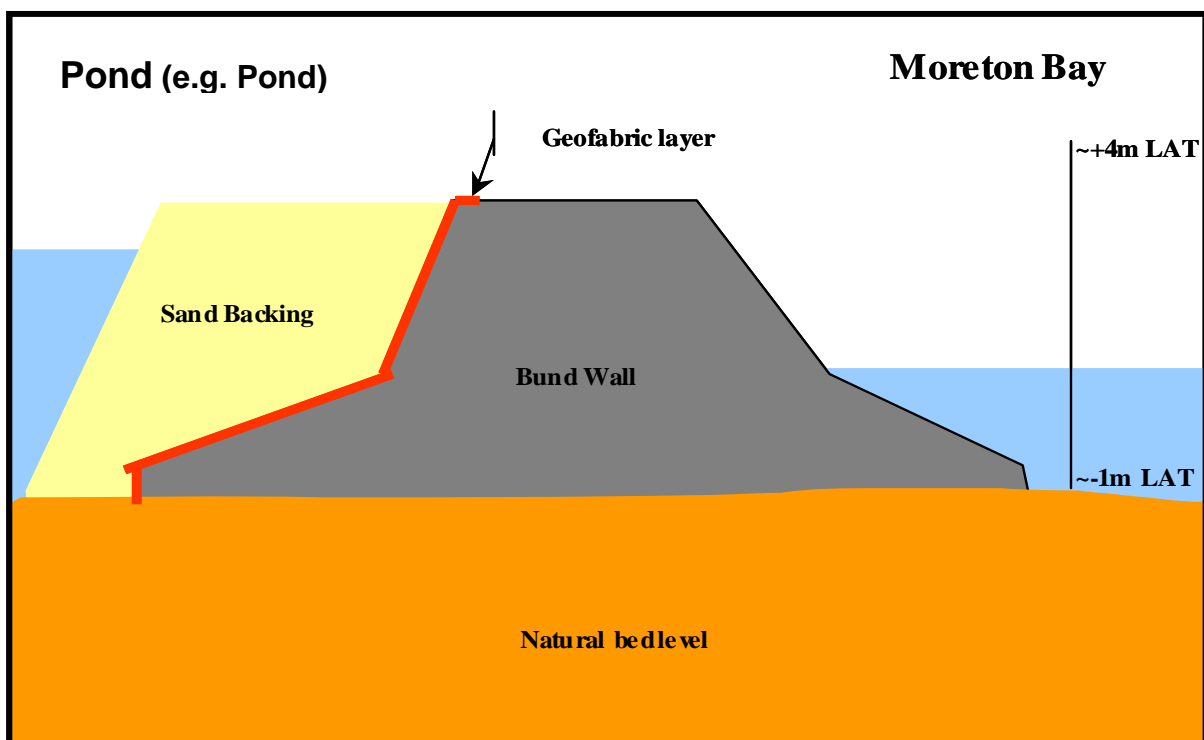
Schematic Cross-Section of Outer Bund Wall – Sealed ponds (R1, R2, R3, B1, B2, B3, B4). Note geofabric layer and sand backing of wall preventing water flows through bunds, but allows filtered seepage
